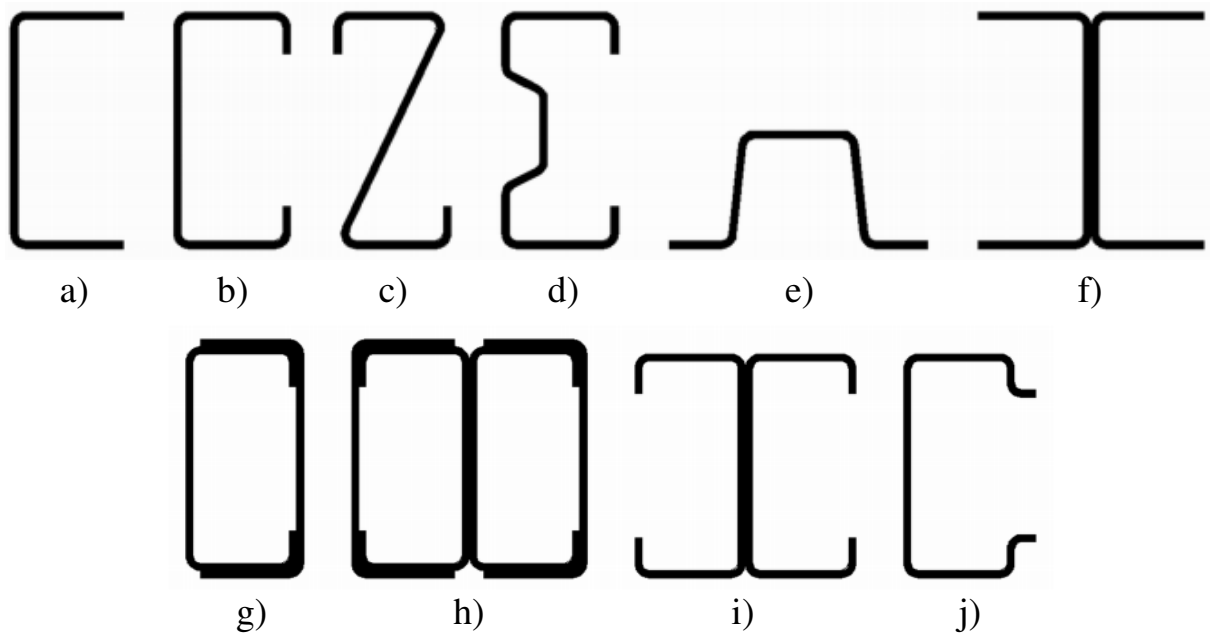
Typical forms of sections for cold-formed steel structural members: a) U (channel) section; b) C (lipped channel) section; c) Z (zed) section; d) Σ (sigma) section; e) Ω (omega) section; f) built-up I (double-U) section; g) built-up R section; h) built-up 2R section; i) built-up lipped I (double-C) section; j) double lipped U (channel) section (Tichelmann *et al.*, 2005; EN 1993-1-3, 2004)
